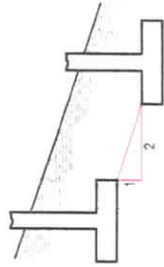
DETAIL OF LIMITING SLOPE OF ADJACENT FOOTINGS
